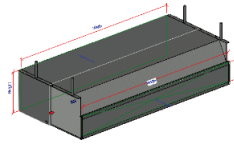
Sample Mechanical Fan Coil Unit 3D-View in Revit
